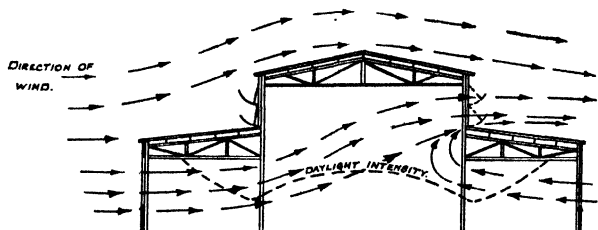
MONITOR ROOF, SHOWING DIRECTION OF VENTILATION AND LIGHT
